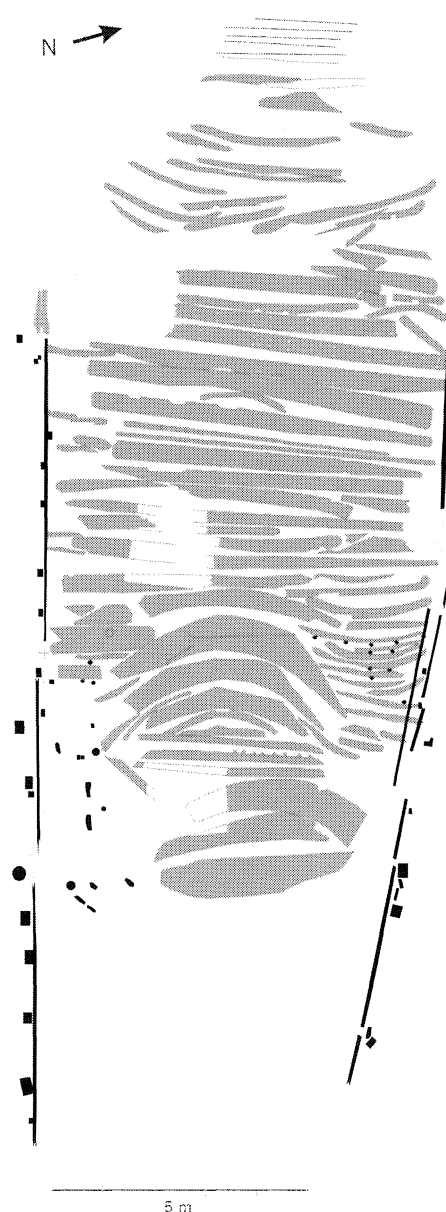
Slipway B: plan of the foundation beams of the second floor, comprising several stem sections (phase II)(Hollandia archaeological consultants).
